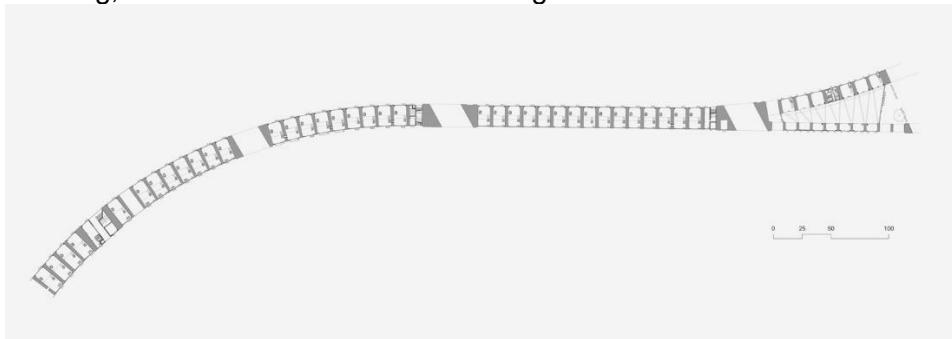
Ground floor plan of the IM Viadukt project., Source: EM2N architects via www.archdaily.com
